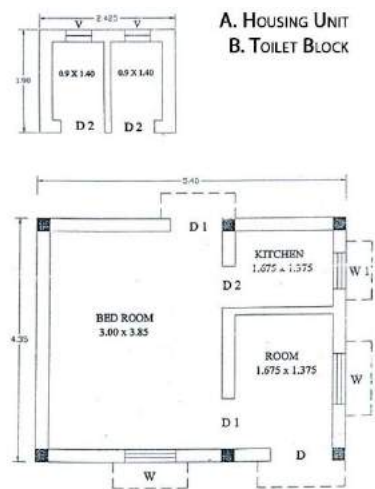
Technical Drawings of ODRP Housing (Source: OSDMA)
